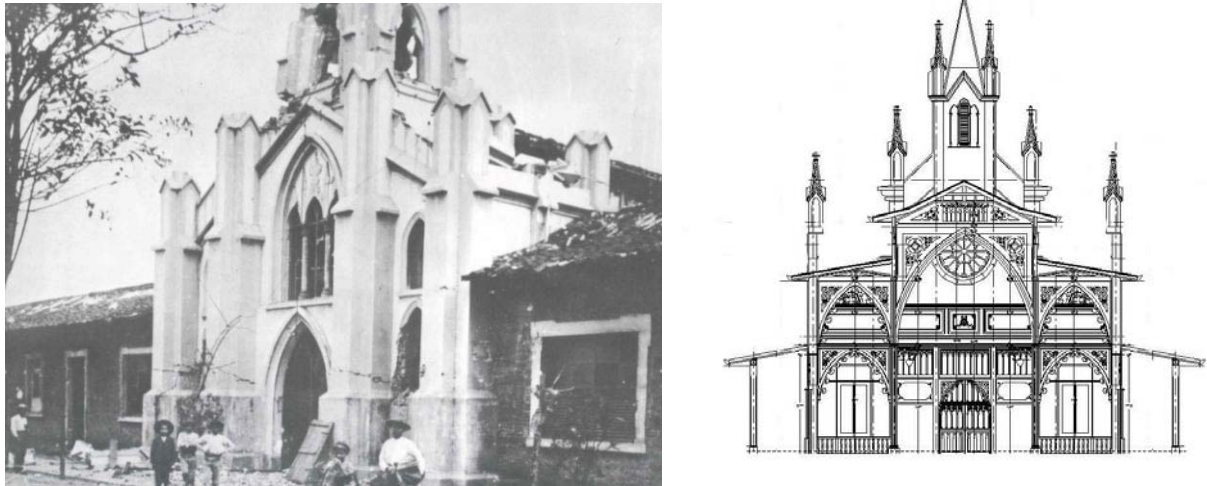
First masonry project of *Maria Auxiliadora* Chapel, later built with metallic structure (pictures from Url-1)
